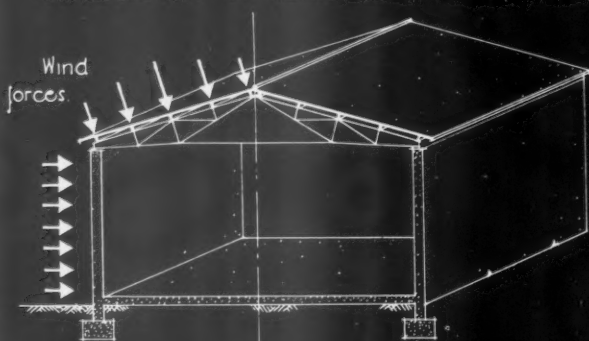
OPEN-ENDED BUILDINGS, OR STRUCTURES WITHOUT CROSS WALLS.
